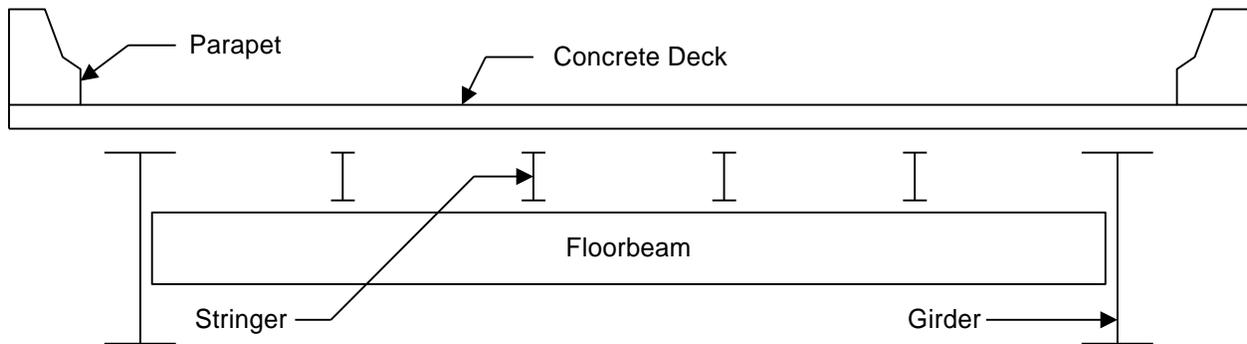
Schematic Cross Section of a Girder-Floorbeam-Stringer Steel Bridge
